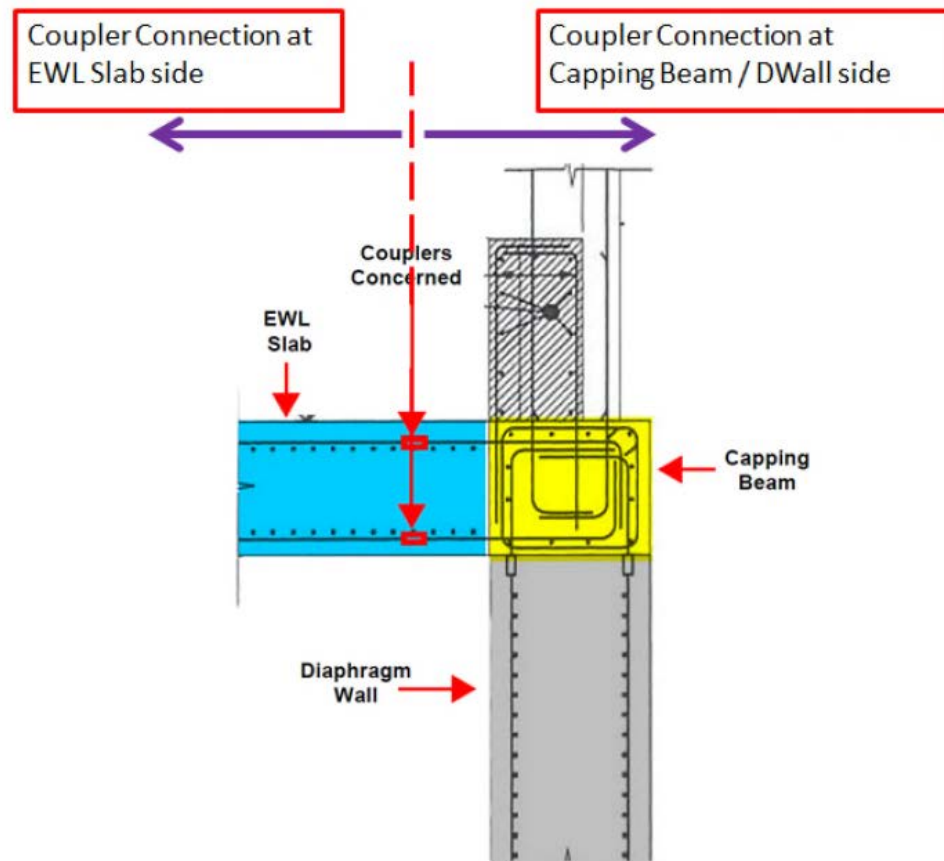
Illustration of the coupler connection at the EWL slab side and capping beam / diaphragm wall side
